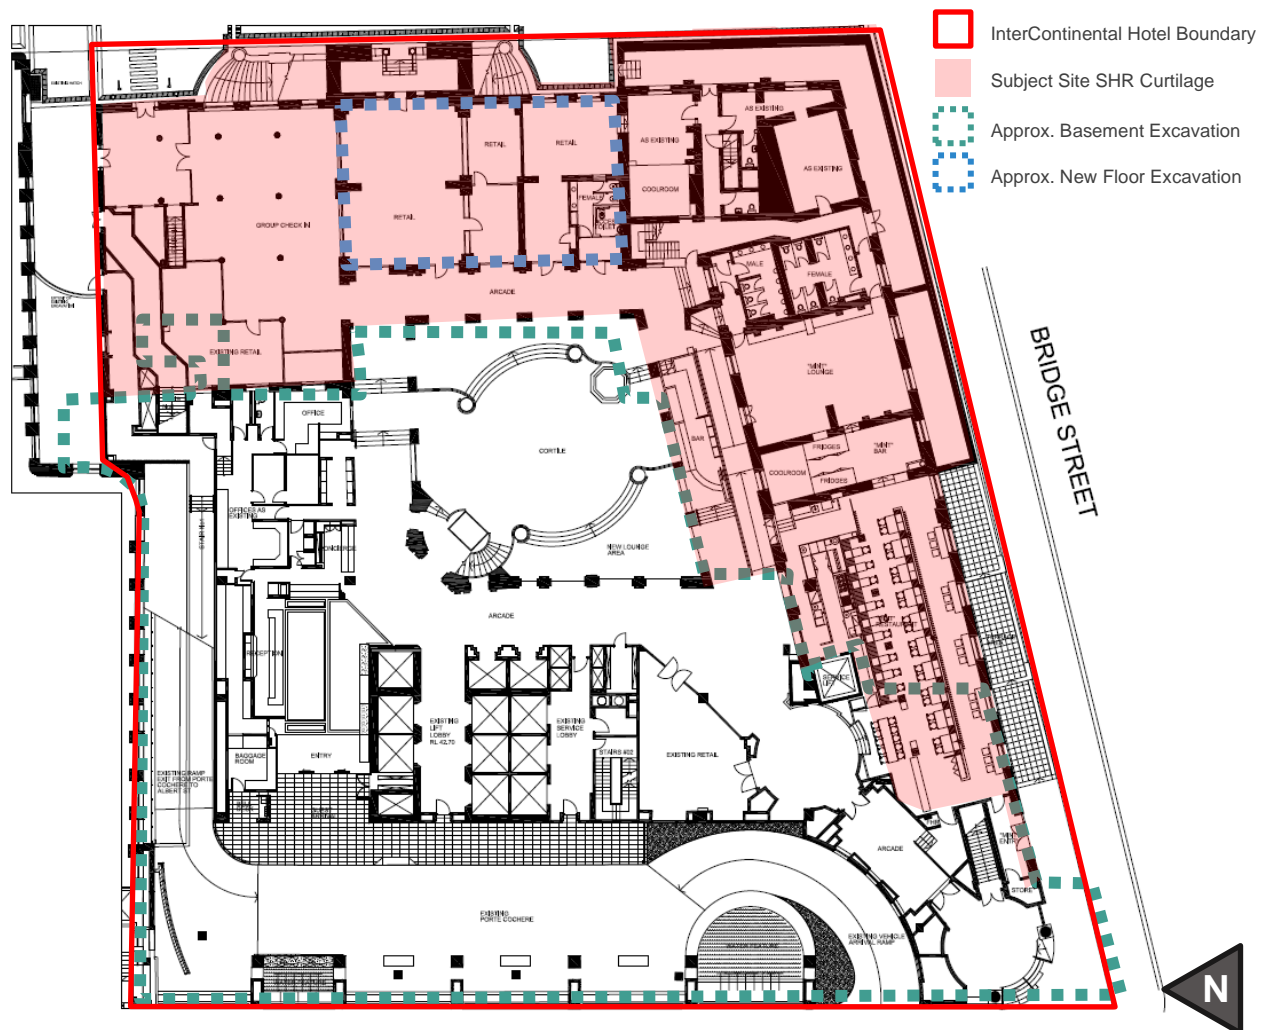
Extract of the 1980s' hotel redevelopment plans for the Basement Floor, showing the approximate location of the largest sub-basement floor (Hotel Basement Level 4) shown in dotted green, as an approximate indication of the extent of excavation undertaken to provide basement space. The approximate area of the Link Building which was excavated and replaced with a new concrete floor is outlined in dotted blue. The broader InterContinental Hotel site boundary is shown in a solid red outline, and the Former Treasury Buildings SHR curtilage (the subject site) is shown shaded red.
